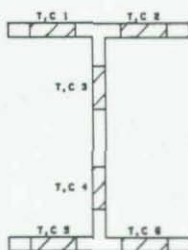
POSITION OF TENSILE AND COMPRESSION TEST SPECIMENS ON SECTIONS
